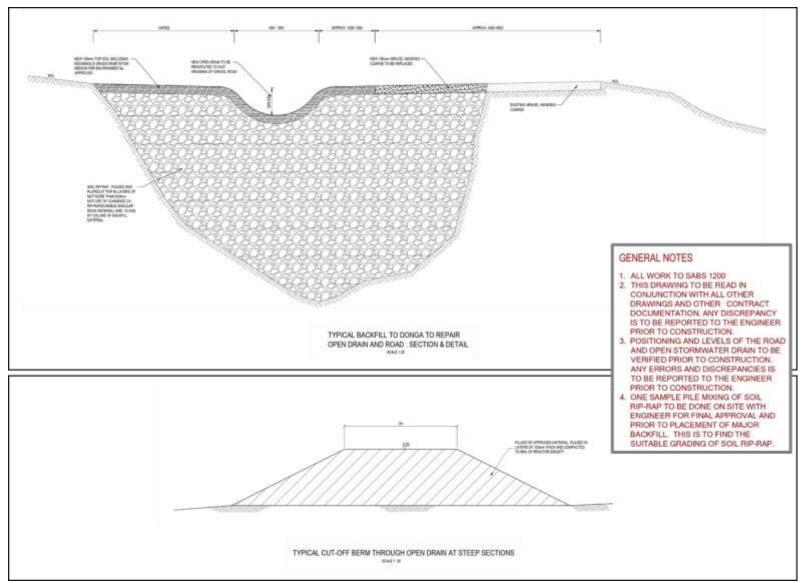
Erosion gully back fill (top) and cut-off berm (bottom) details as provided by DMS Consulting Structural Engineering (March 2022).
